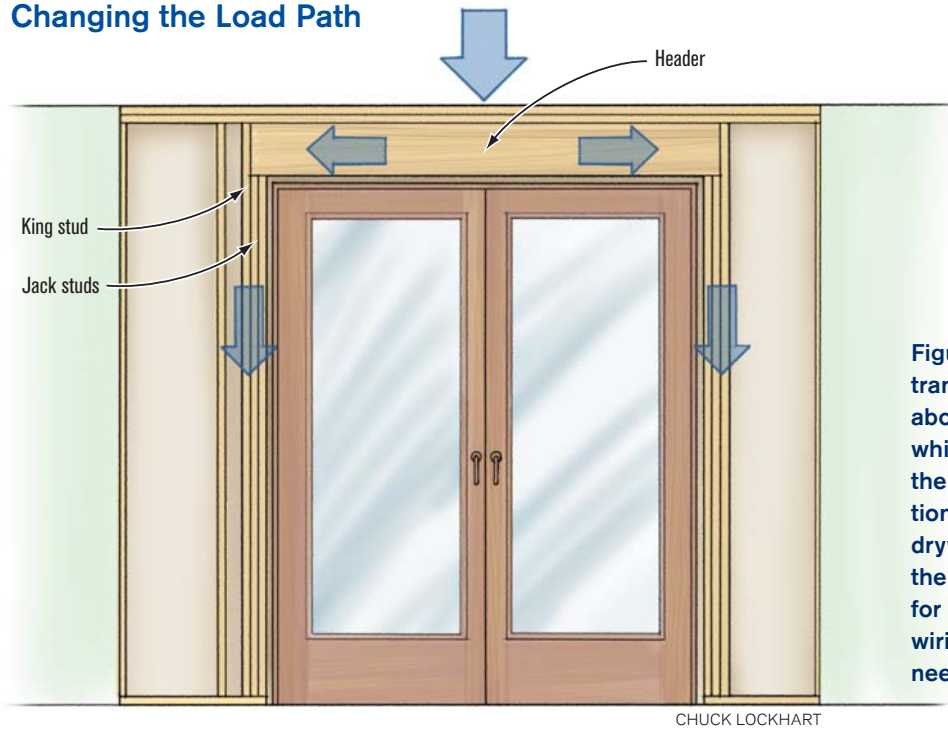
The new header transfers loads from above to the jack studs, which in turn bear on the framing or foundation below. Removing the drywall to either side of the door provides access for nailing and whatever wiring and plumbing may need to be done.
